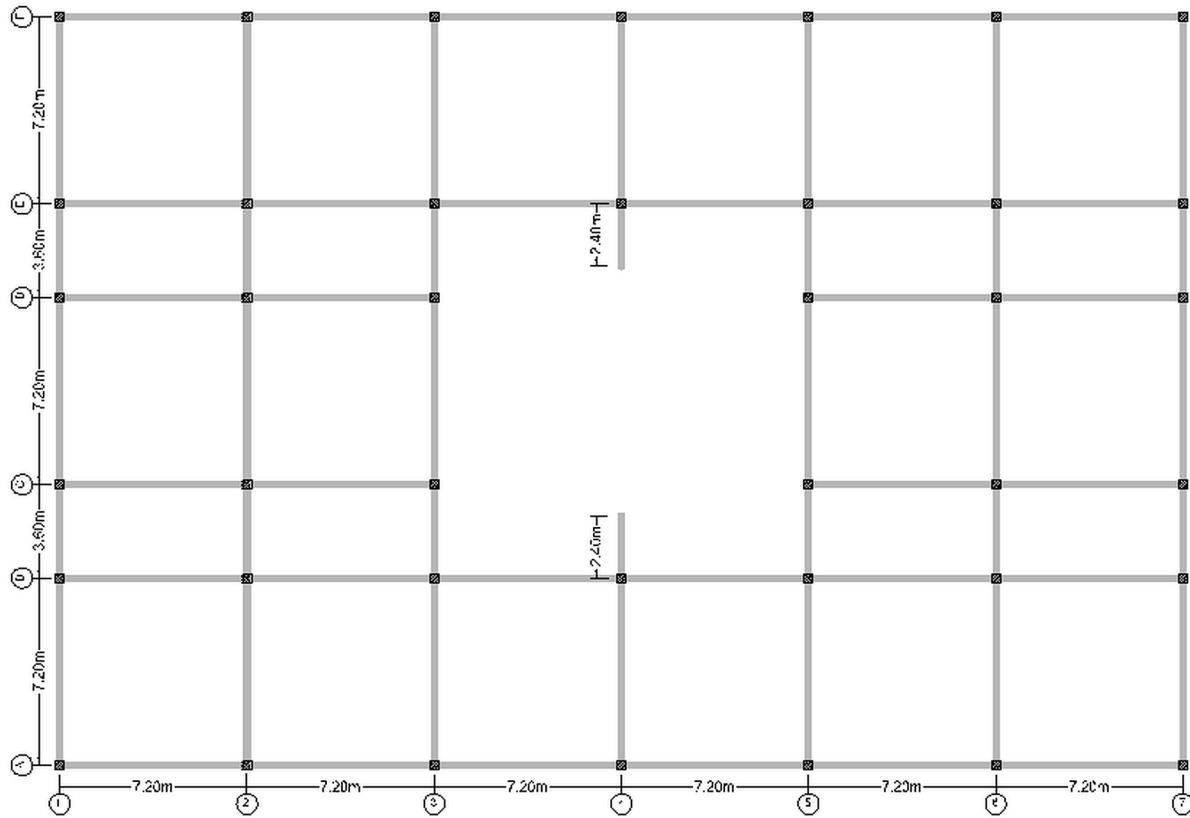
Educational facility, geometry and reinforcement in columns of Frame A = Frame B
